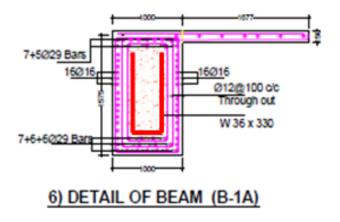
Old Design with Embedded U Zinc Coated Steel Plate
